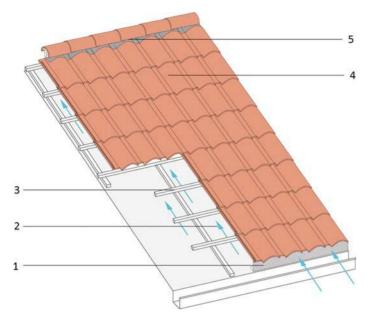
A ventilated pitch roof with a discontinuous covering: (1) ventilated eaves (bird stopping); (2) ASV; (3) batten and counter-batten; (4) Portuguese roof tiles and (5) ventilated ridge.
